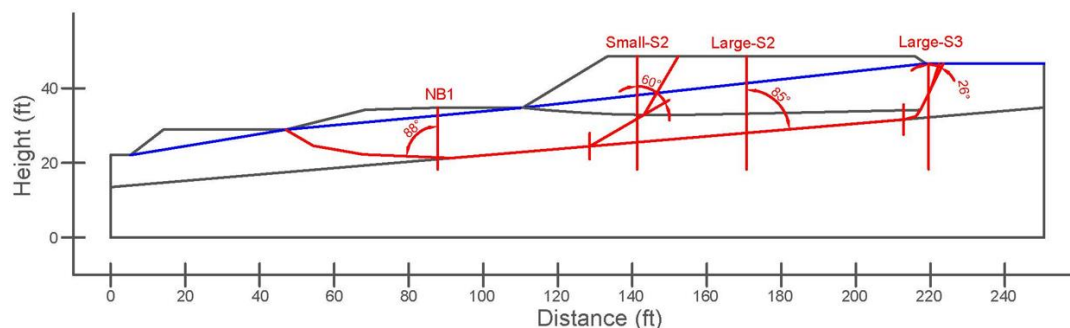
Sub-sectioning of the cross-section and failure planes for Nalband Railway Embankment
